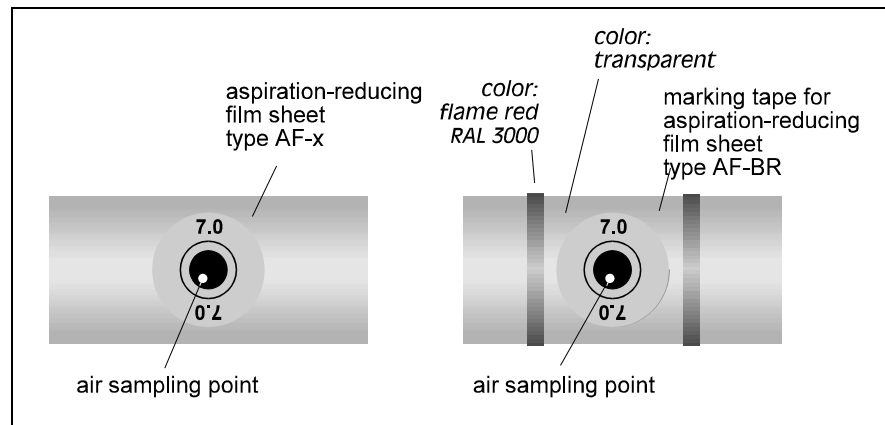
Example of an air sampling hole with an aspiration-reducing film sheet
